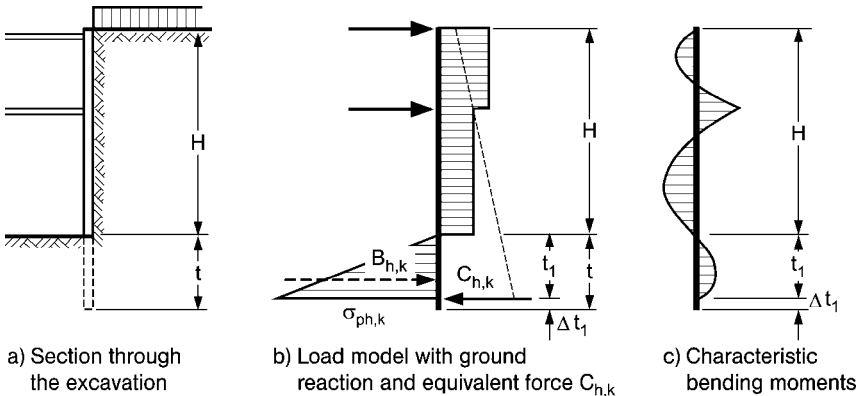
System, loading and moment distribution for a double-propped soldier pile wall with fixed earth support
